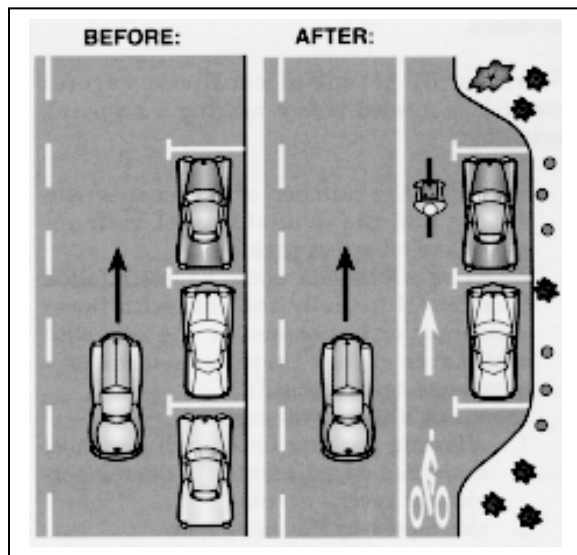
Example of retrofitting street to accommodate bike lanes and on-street parking
